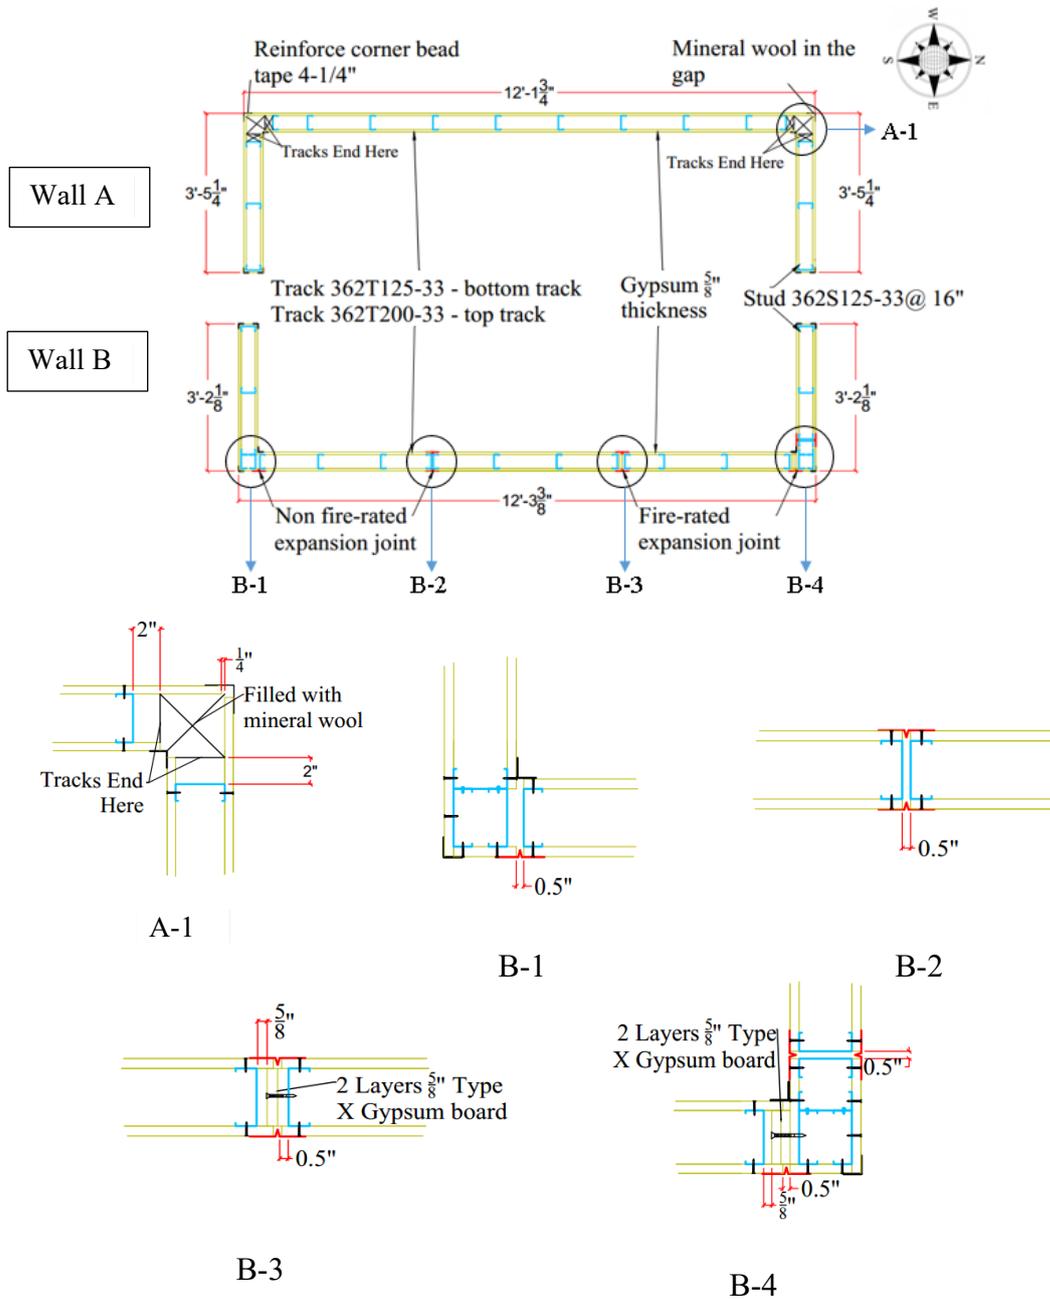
Drywall partition walls with different detailing: Wall A = corner gap and Wall B = distributed gap; (A-1) corner gap detail; (B-1) wall intersection non-fire rated expansion joint; (B-2) interior non-fire-rated expansion joint; (B-3) interior fire-rated expansion joint; (B-4) wall intersection fire-rated expansion joint.
